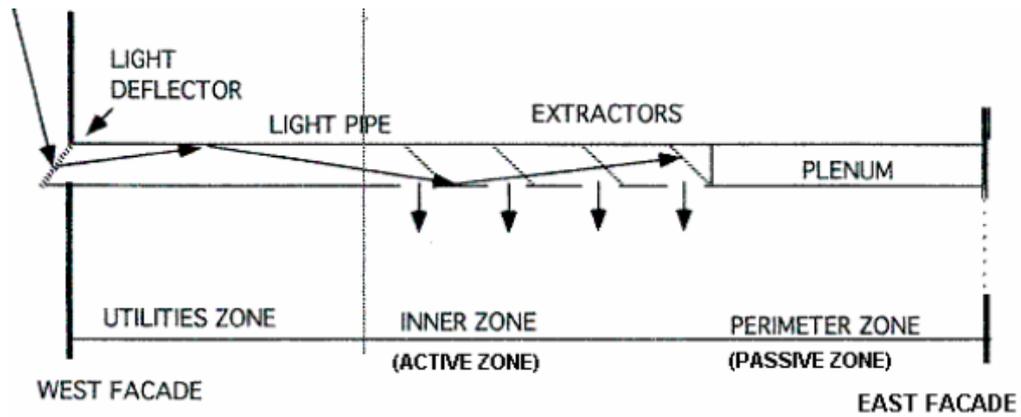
Horizontal light pipe (Yeang, 2003)
